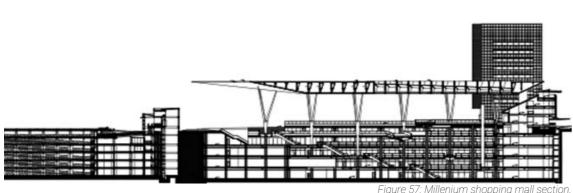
Millenium shopping mall section. Source: Arquitectura panamericana.
